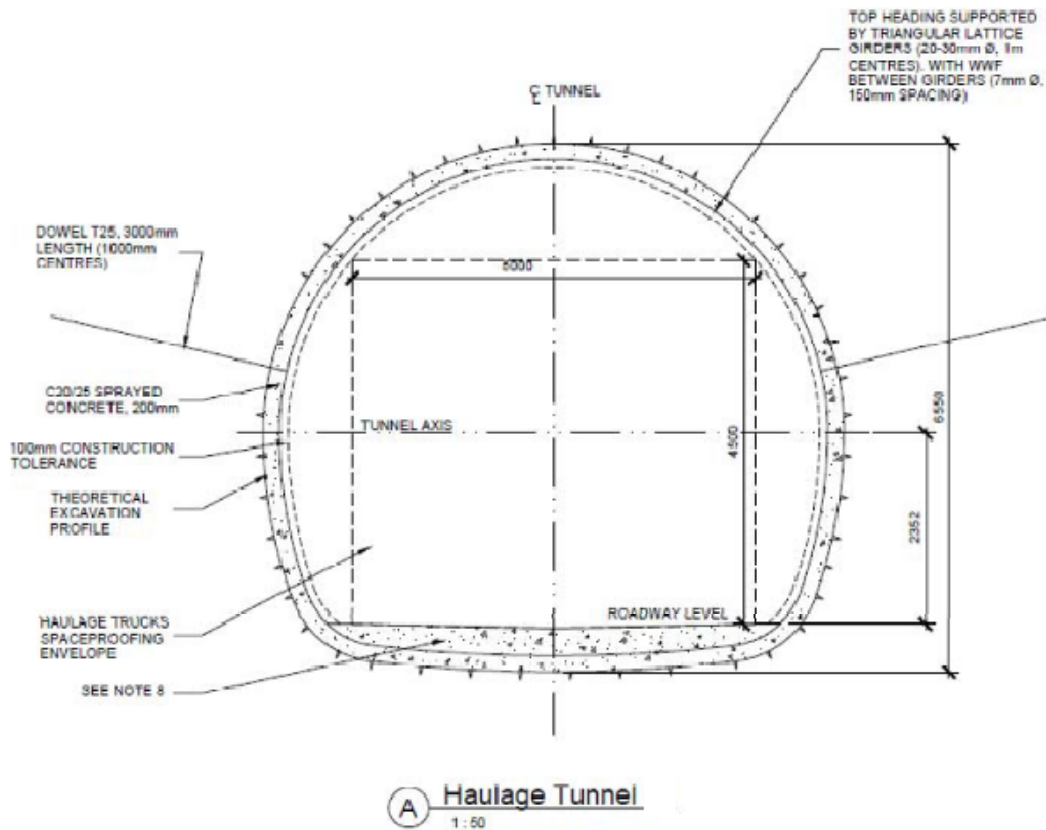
Existing Haulage Tunnel, Spaceproofing Cross Section
